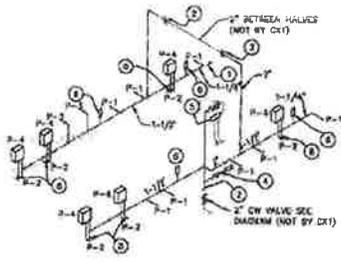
DETAIL OF FIELD INSTALLED WASTE CONNECTION
